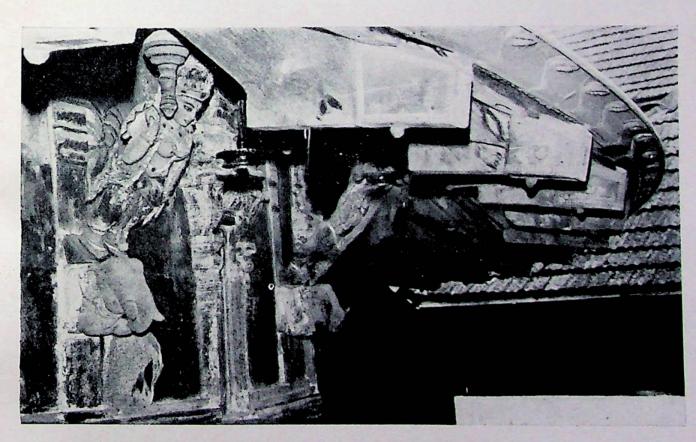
Srikovil wall and roof structure of Peruntirkkoyil Śiva.
